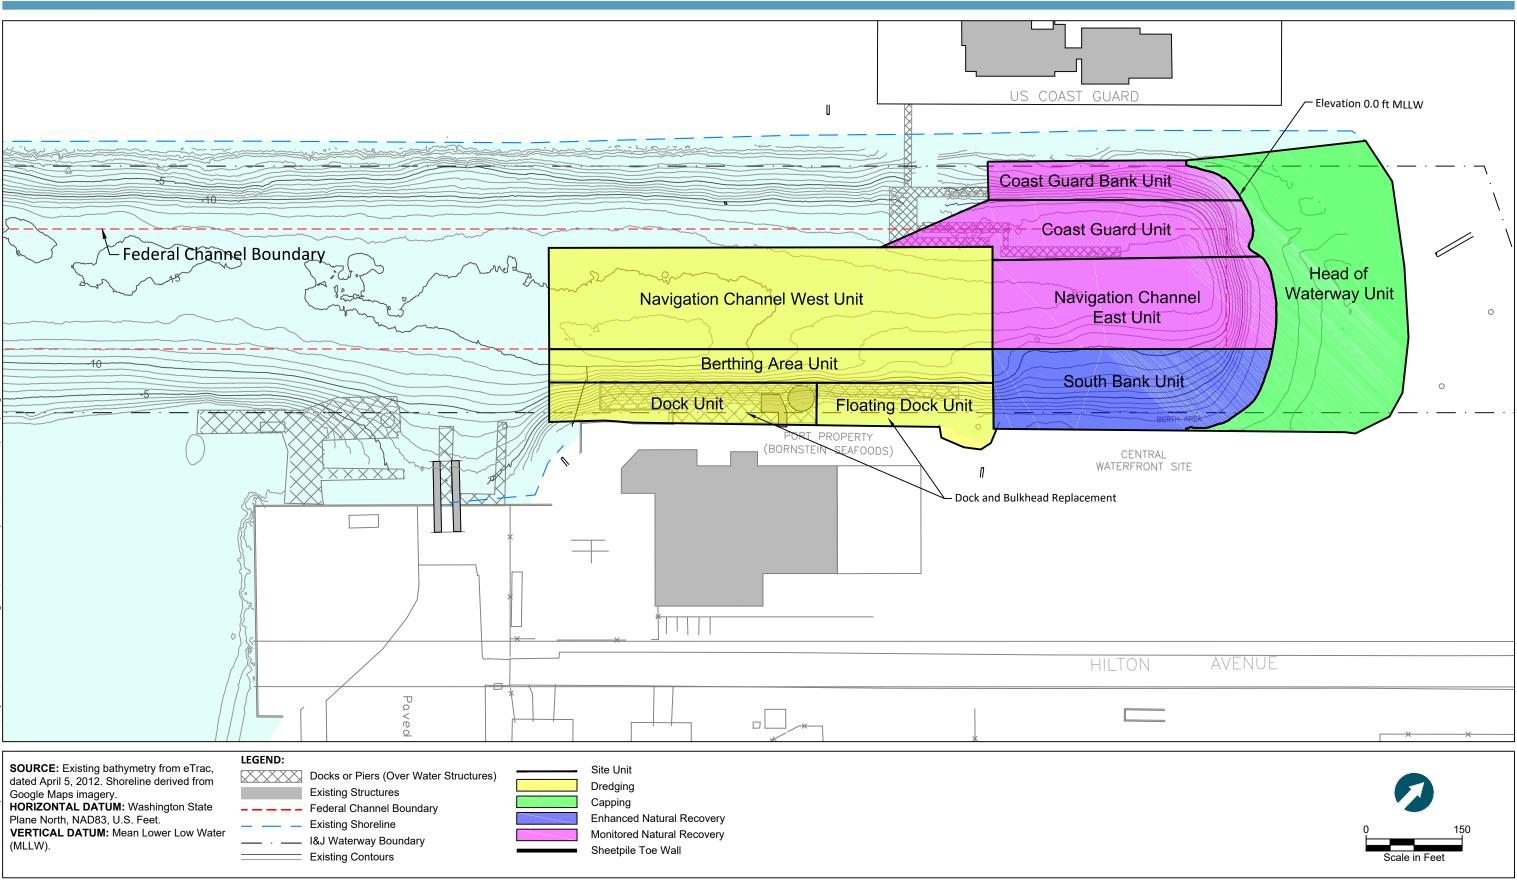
Alternative 4 Cleanup Action Plan I&J Waterway Site Port of Bellingham
